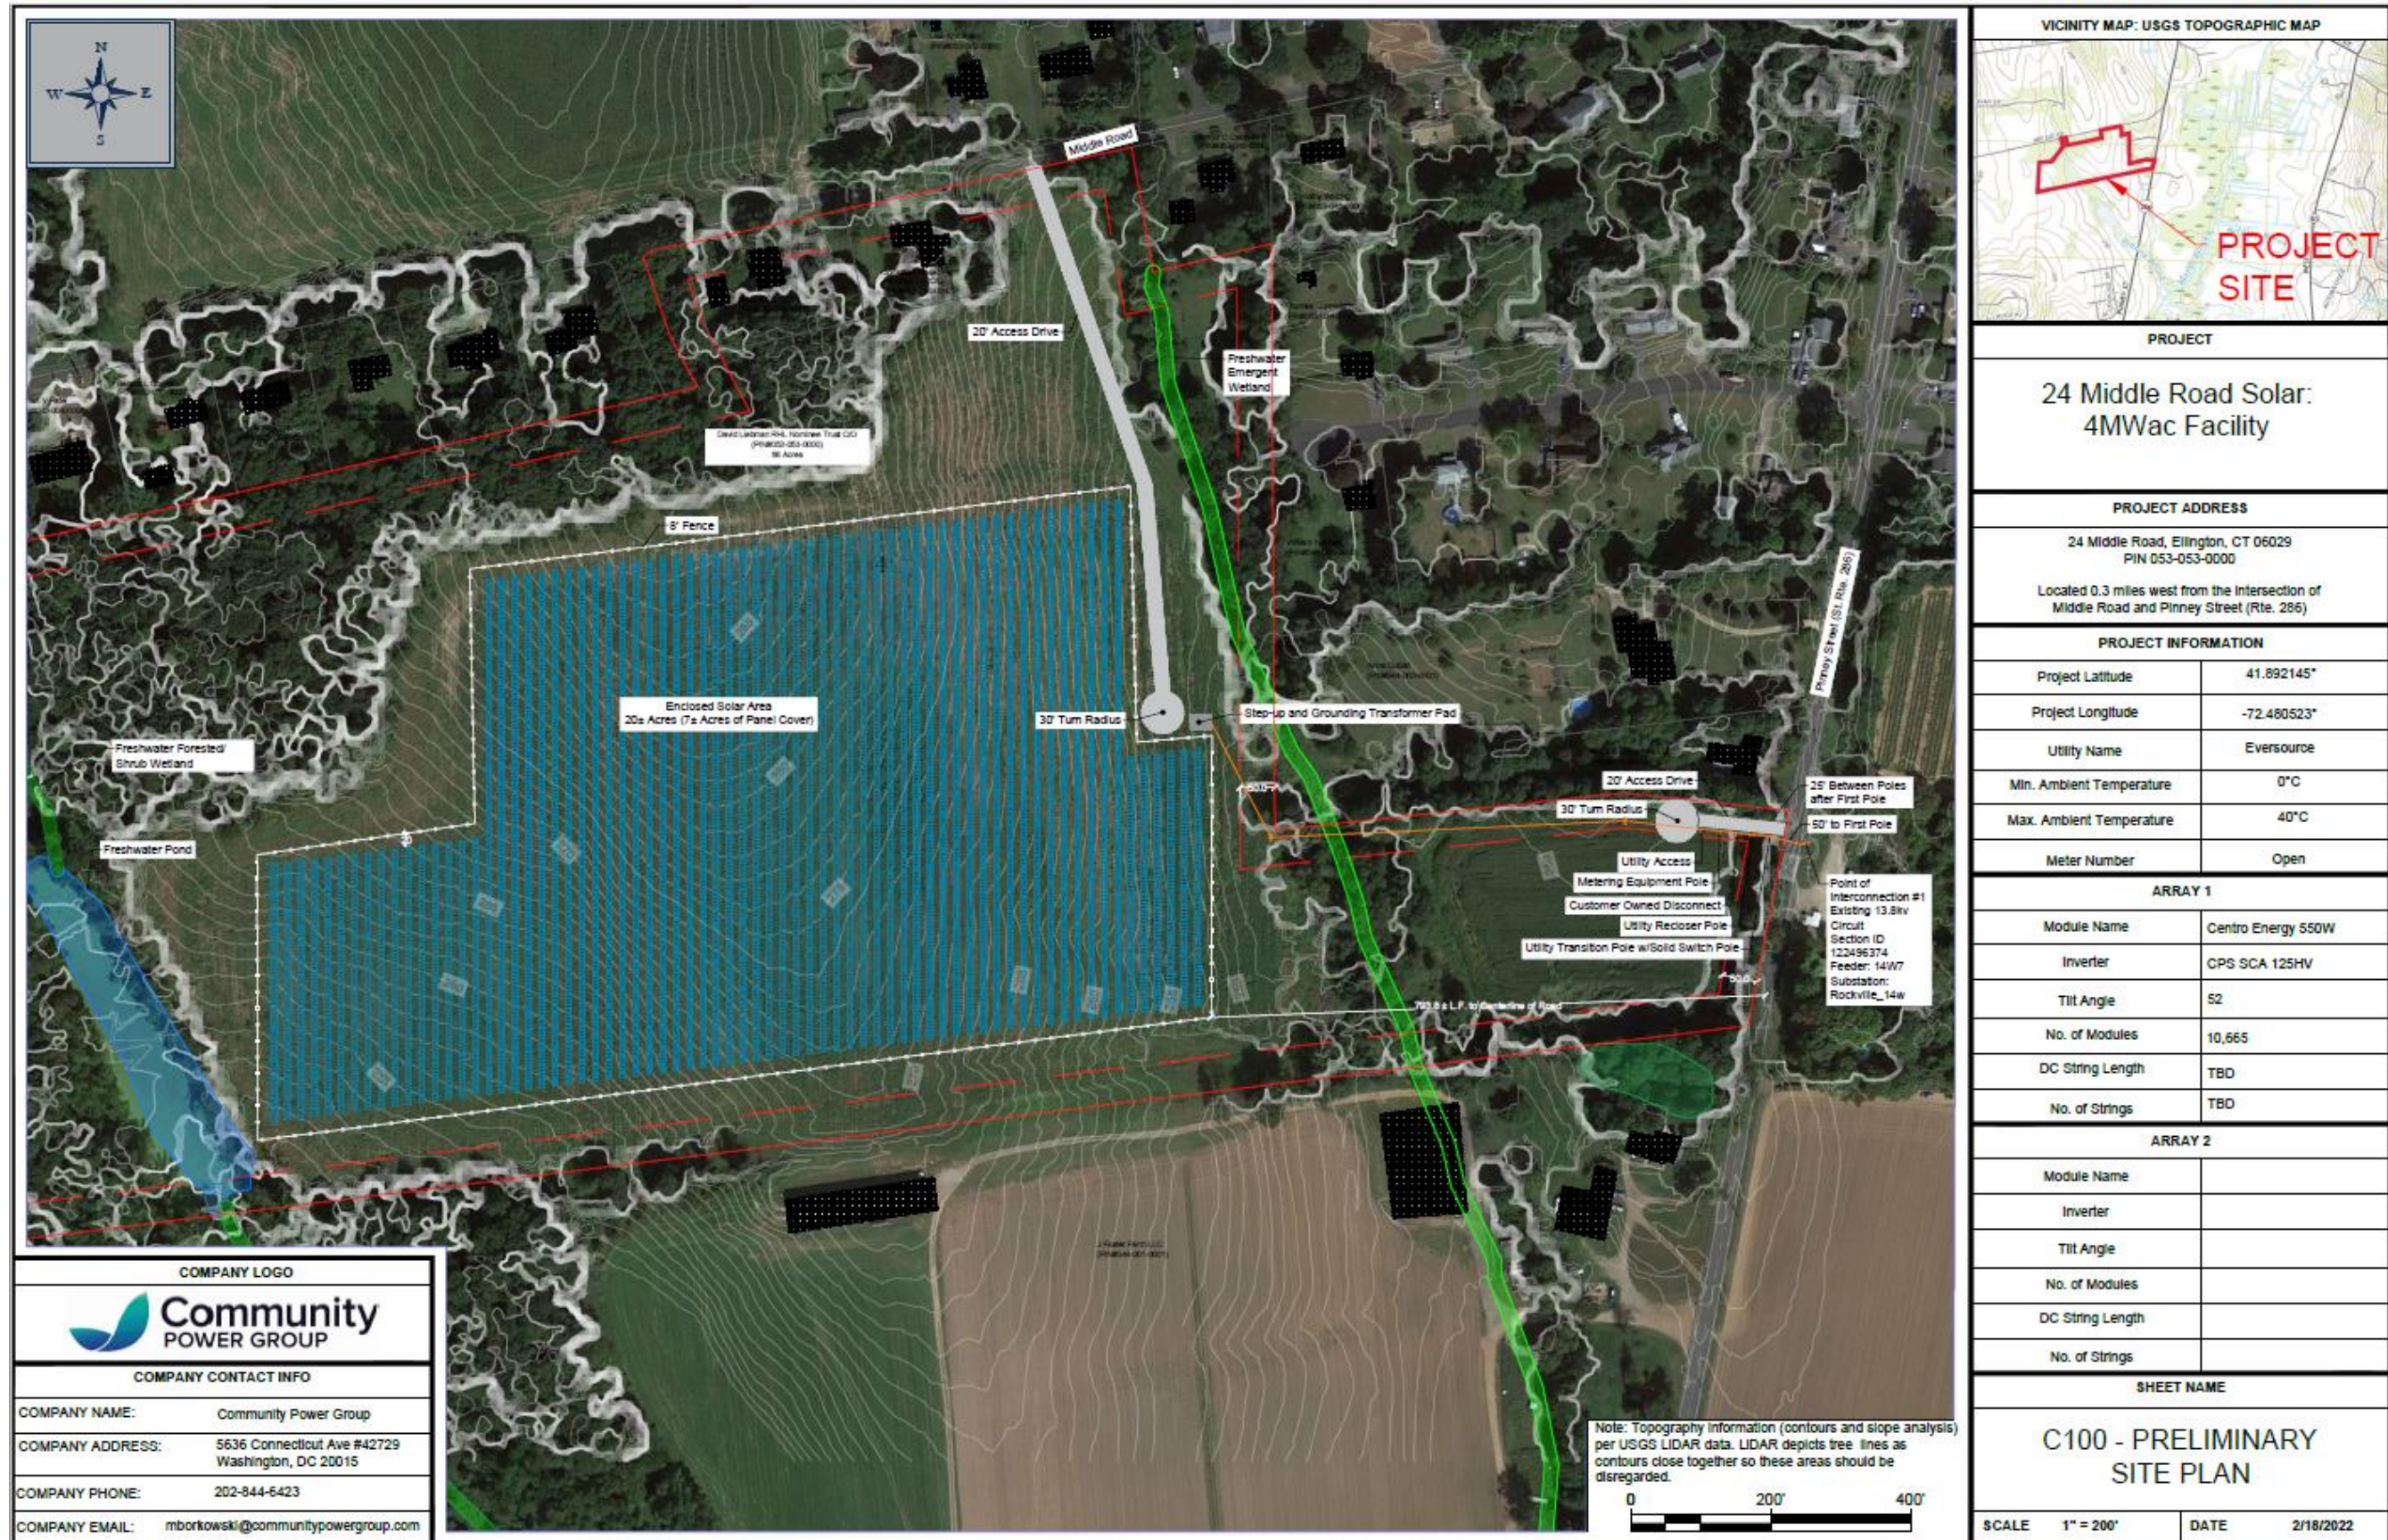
Project plans for the proposed solar facility in Ellington, Connecticut.
